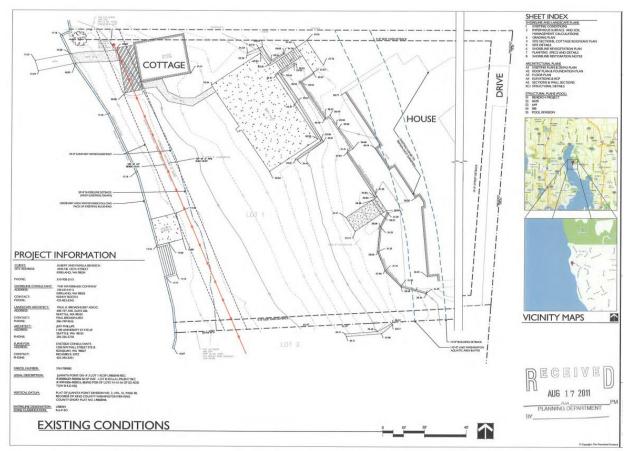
Figure D. Example of an Existing Conditions Plan for a single property. Credit: The Watershed Company.
